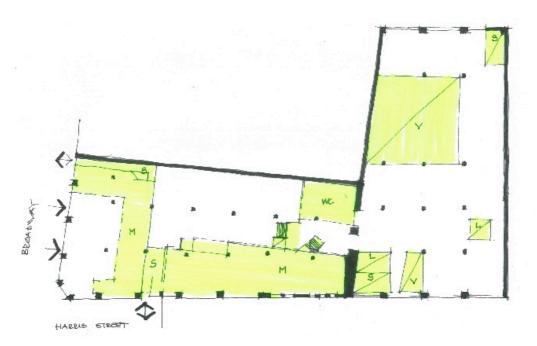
Bon Marche Building Level 2. The main floor was on two main levels (reflected in the stair in the centre of the building), later changes have lowered the main floor along Harris Street, added a mezzanine to the Broadway corner tenancy and above the retail tenancies along Harris Street, cut two large voids in the 1928 wing and added lifts, stairs and amenities. The areas shaded yellow have had changed levels, floors removed and new elements such as stairs and lifts inserted.
